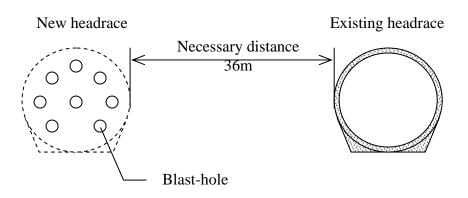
Distance between New headrace tunnel and Existing headrace tunnel
